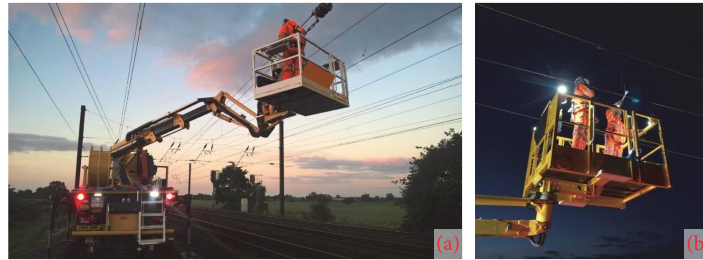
Staff repairing droppers at high-level: (a) installing new dropper and (b) repositioning shifted dropper.
